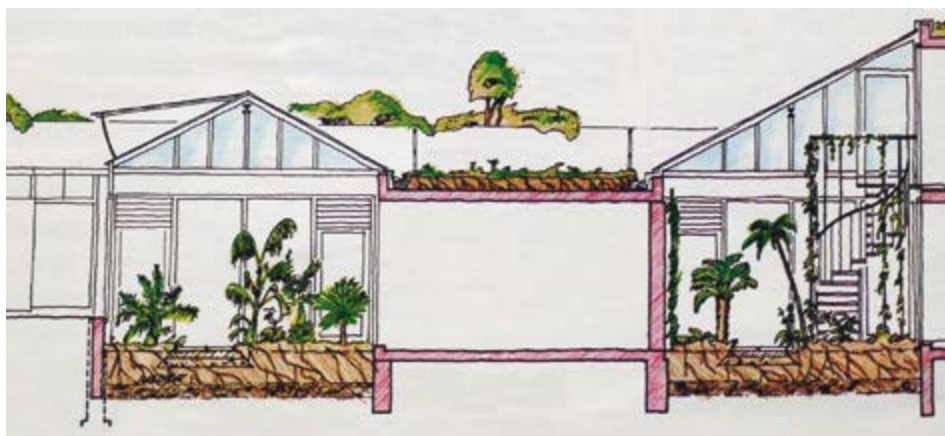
Cross section of the "house in house" from Erich Schneider-Wessling.
